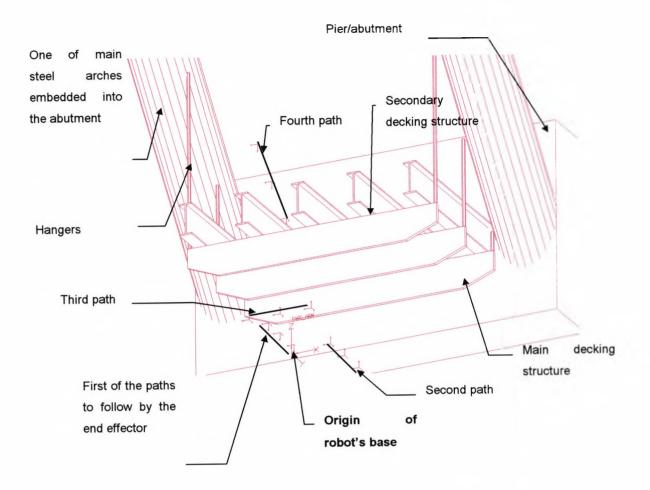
Bridge Detail [D2] according to Table 4.3
